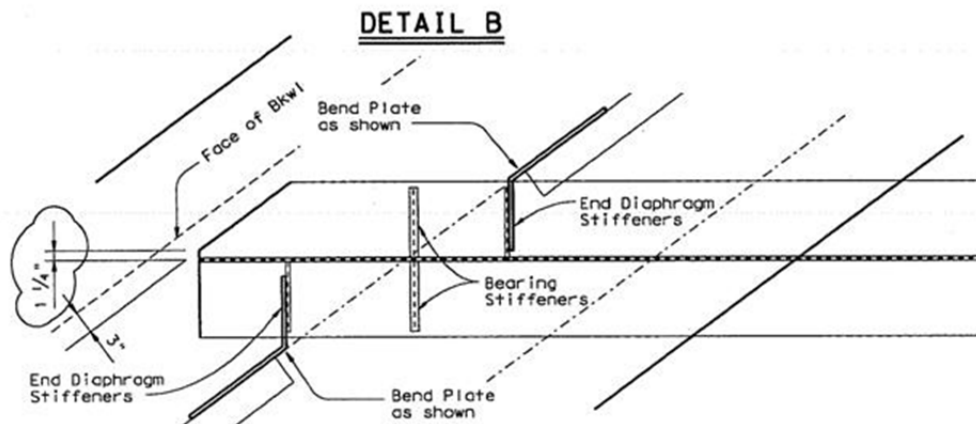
Cross-frame connection for US 82 at 9th St. underpass Lubbock, TX
